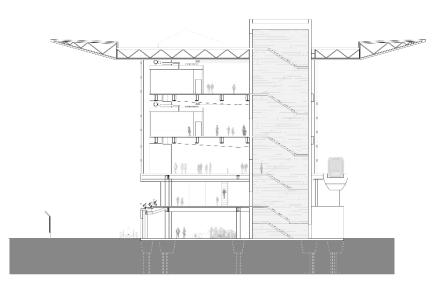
Building Section 3 (Source: Created By Author Nicholas DiBella)
